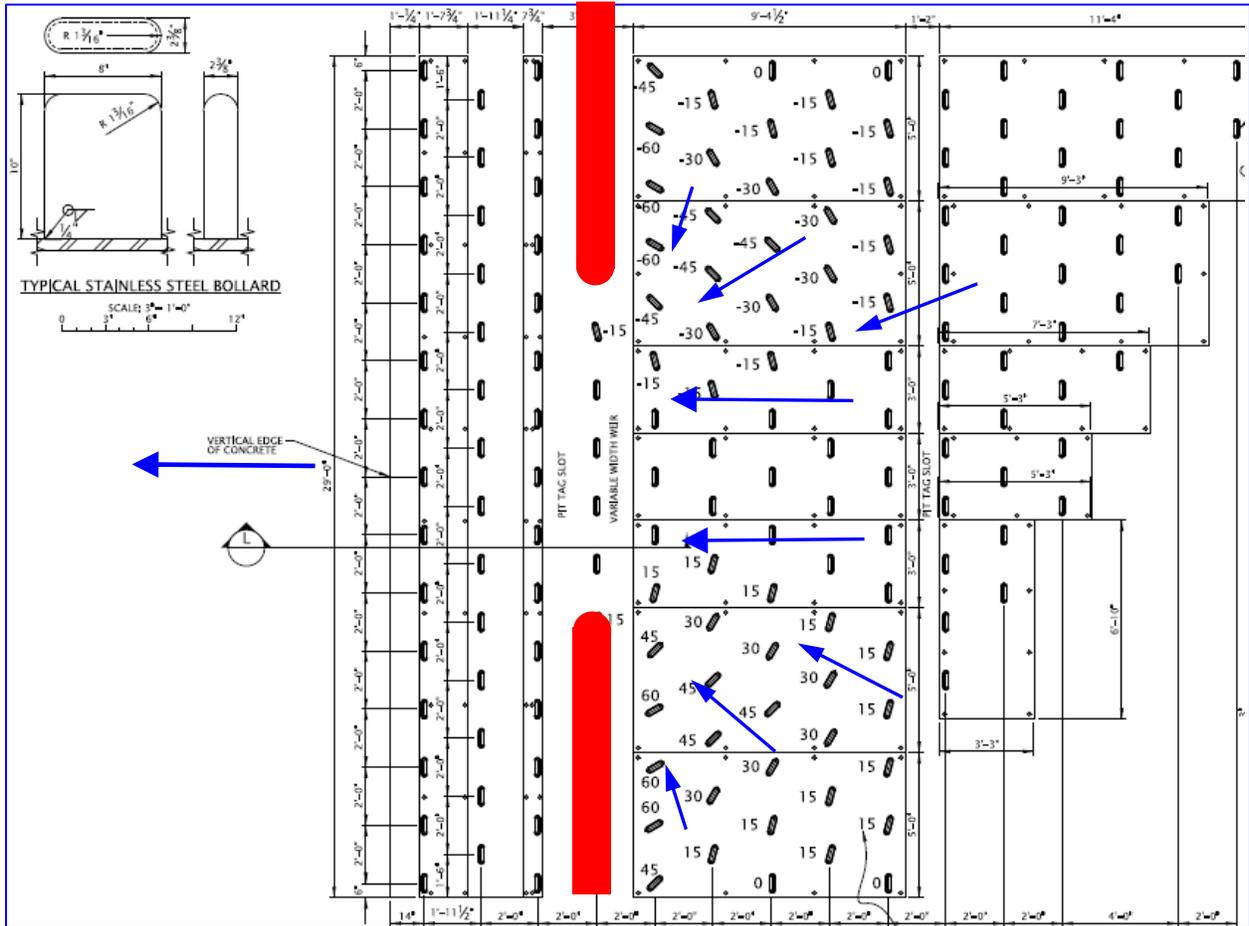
Plan Schematic of Paddle Bollard Arrangement at John Day North Fishladder.
